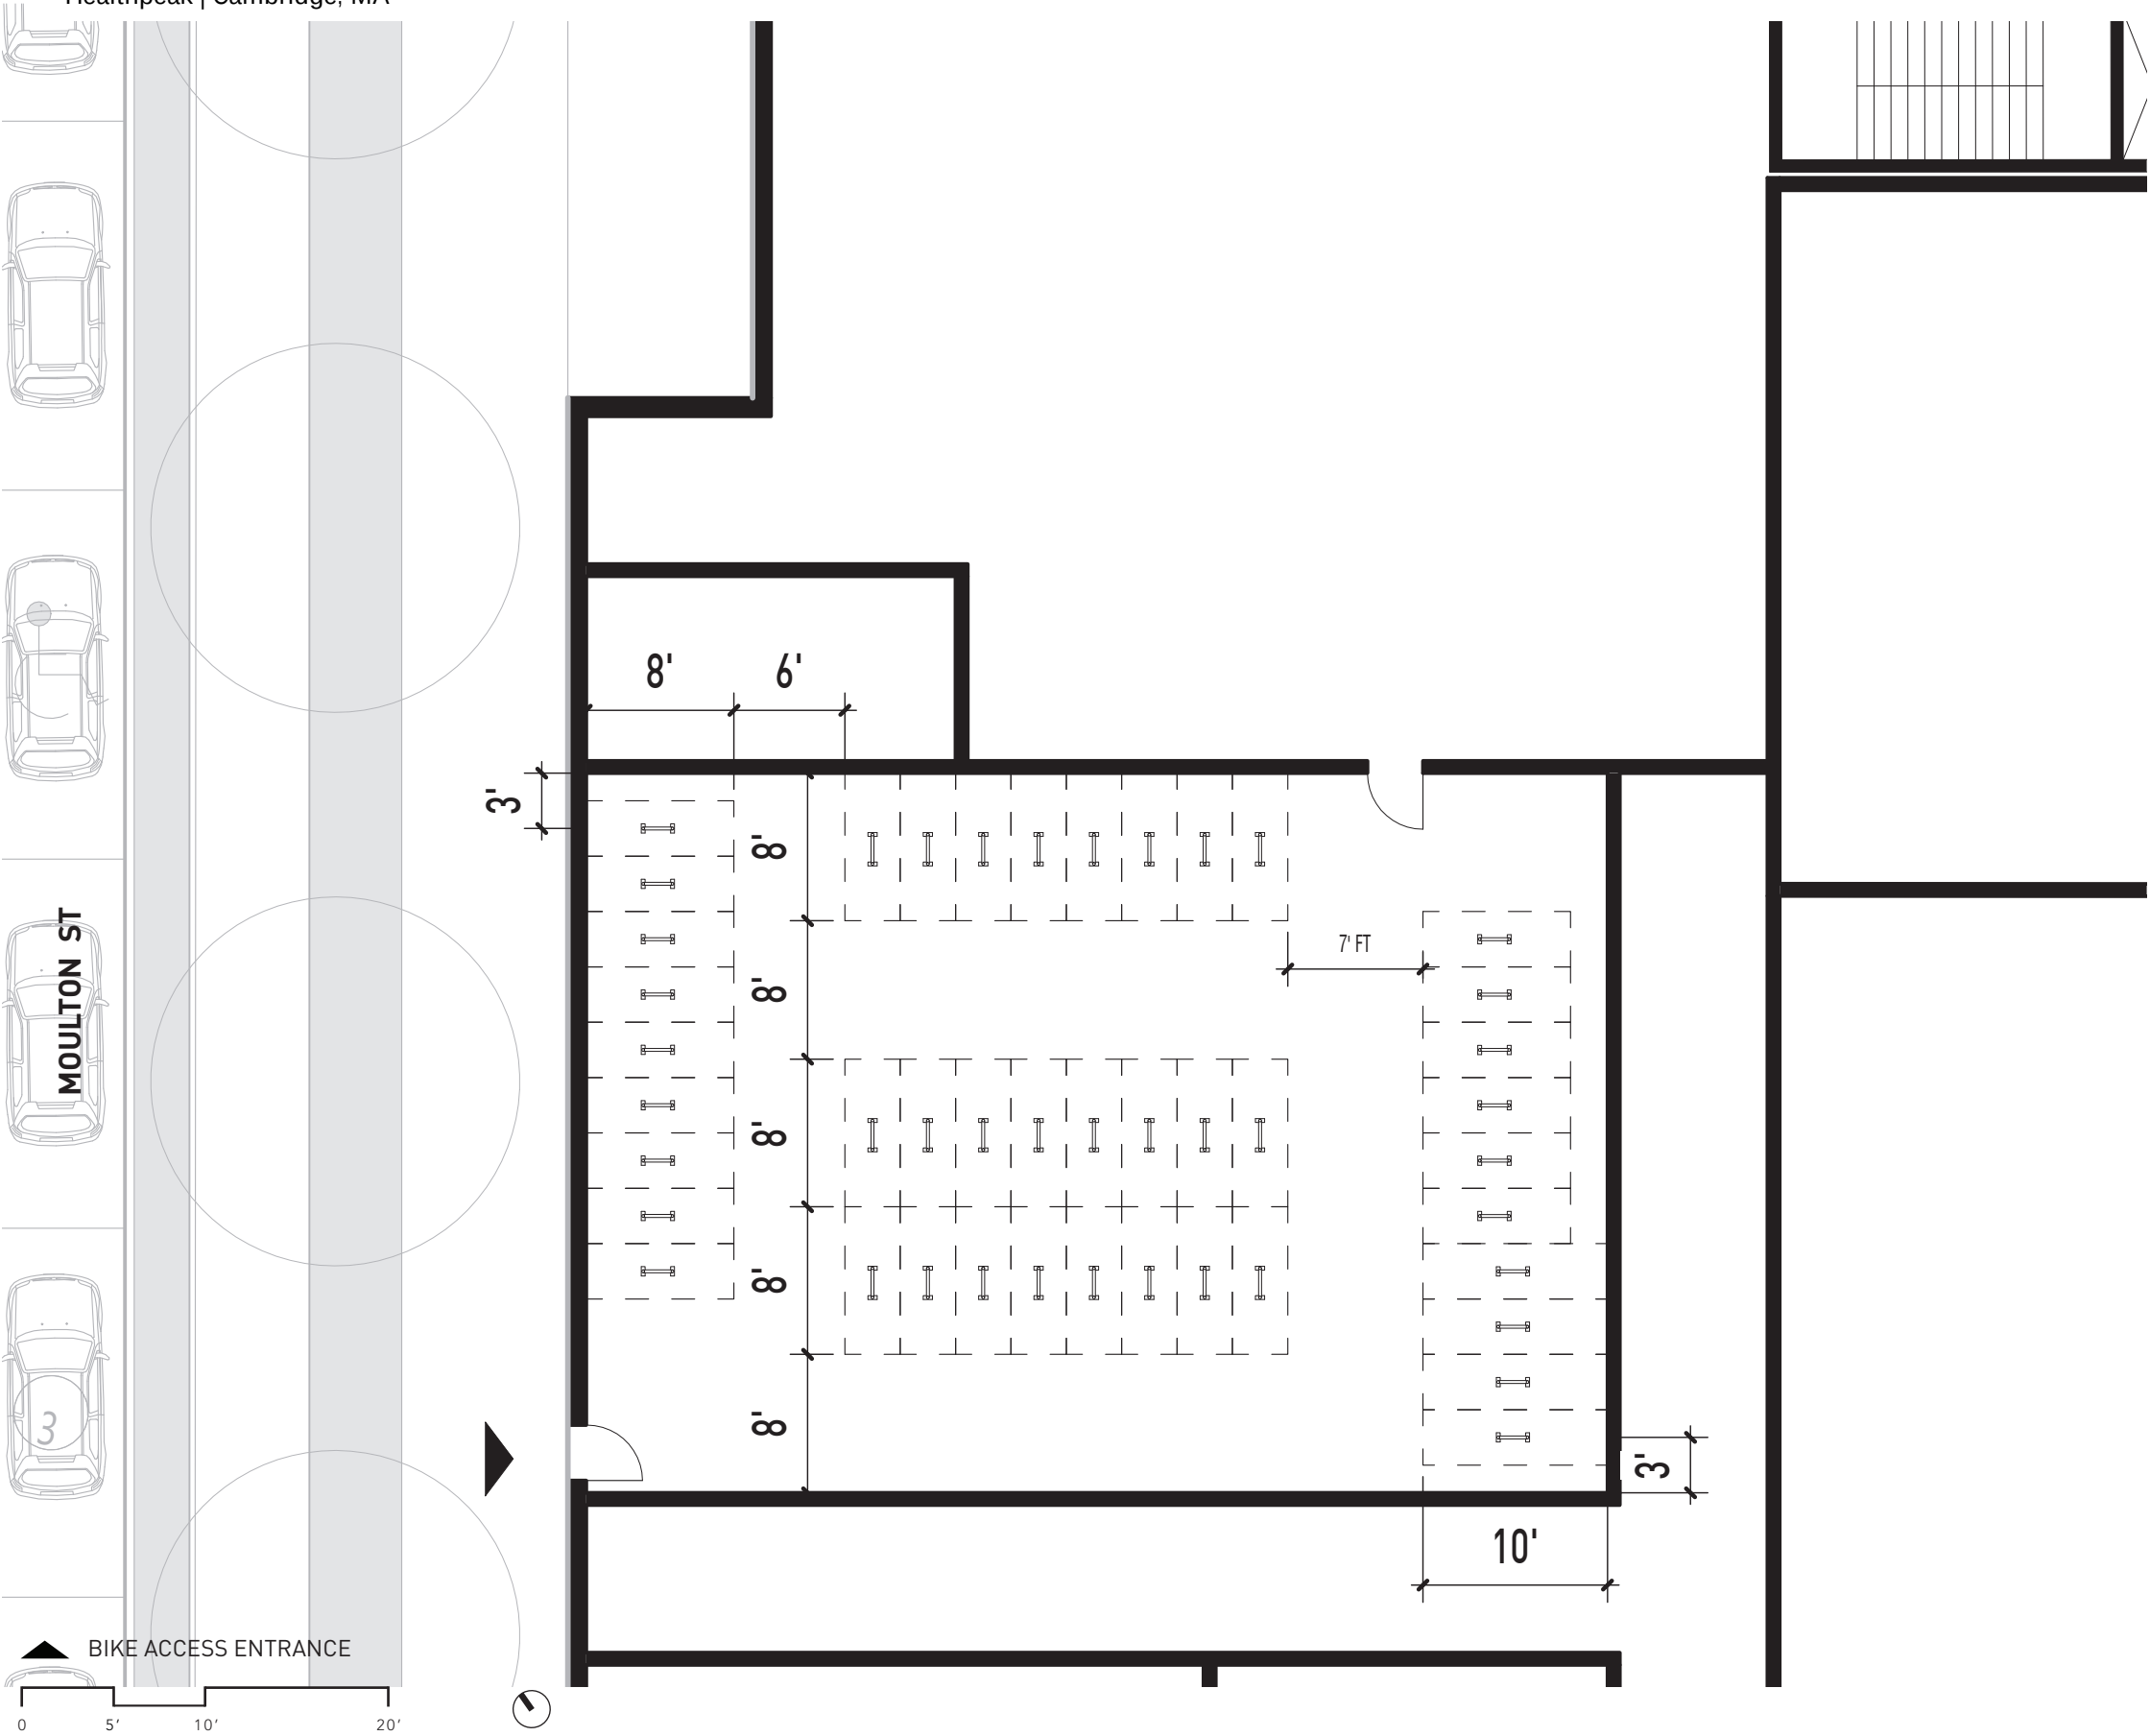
Proposed Bicycle Parking Key Plan - C7
